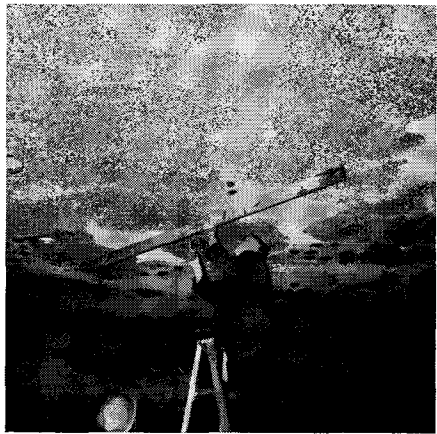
Checking depth of spall of lightweight concrete at ceiling of Room 21. Maximum depth of spall was 1¾ in. over a spot one ft. square; average depth was ¾ in. over west end.
